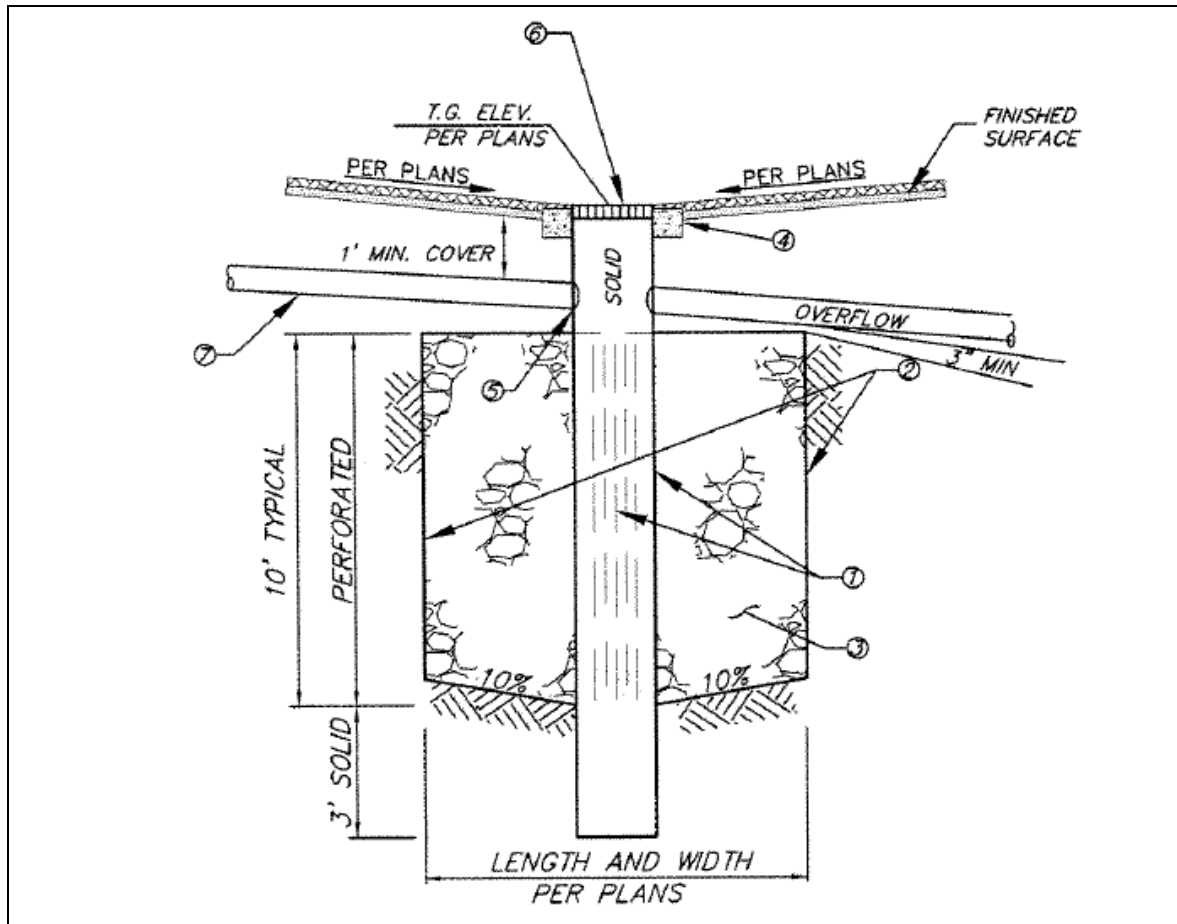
Drywell Detail from Town of Mammoth Lakes Standard Plans 2006
